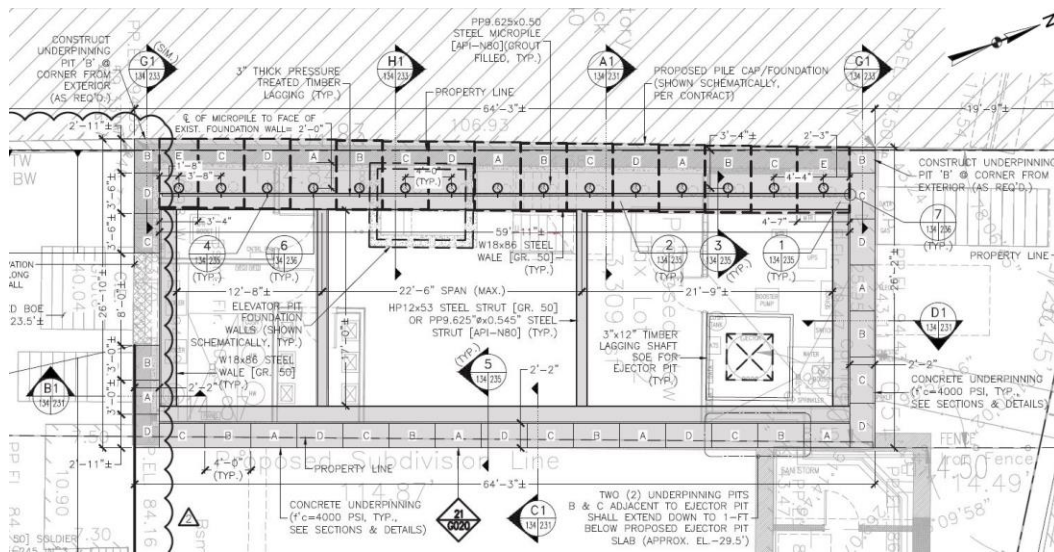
Western Portion of the 1826 Building Proposed Townhouse Underpinning Plan
